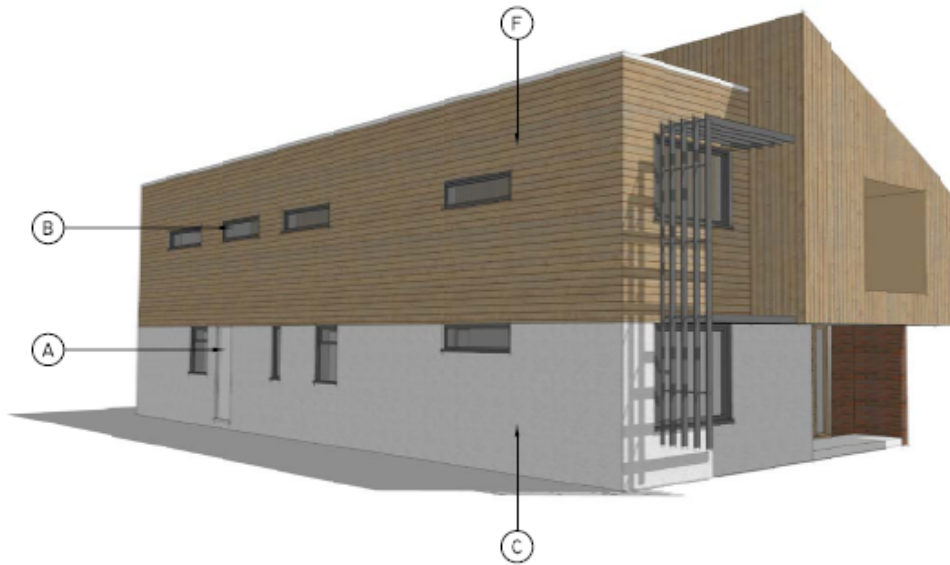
WEST/SOUTH FACING PERSPECTIVE
